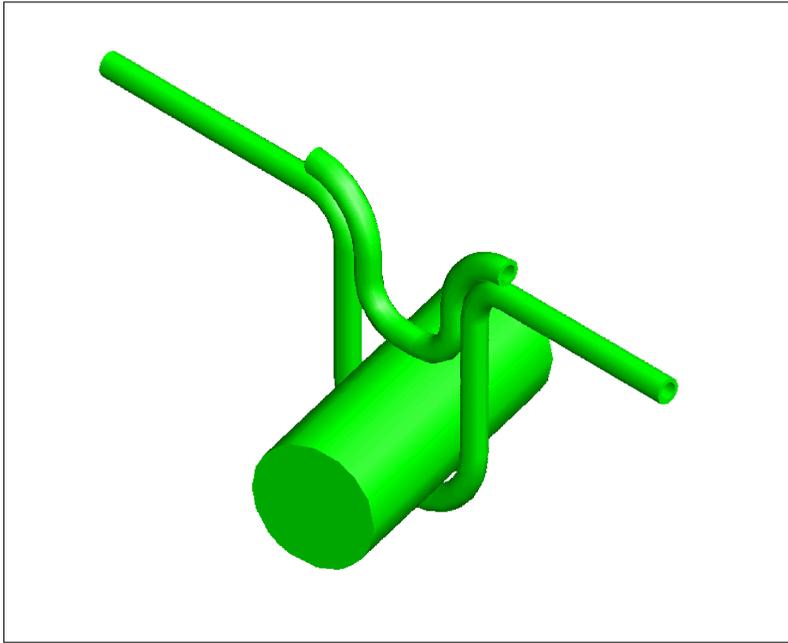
U-shaped reinforcement with pipe, case 1.
